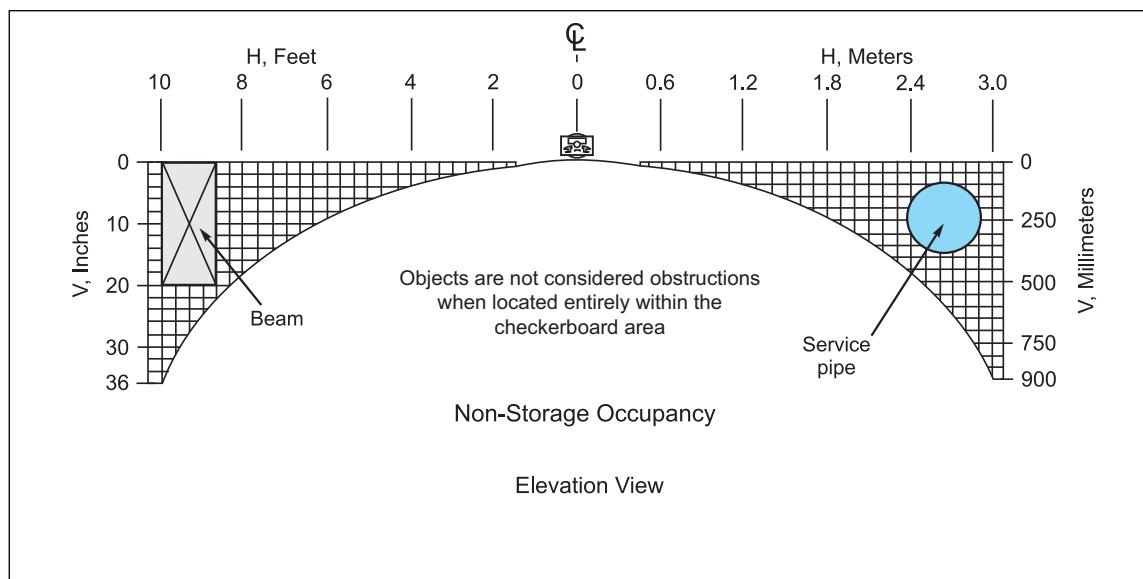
(b). Objects near ceiling level not considered obstructions to extended-coverage Nonstorage sidewall sprinklers along the mounting wall
